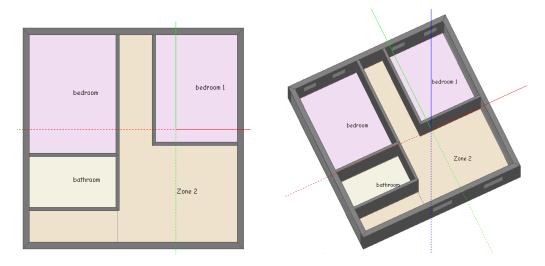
Floor plan of first floor Mid-terrace Model (and view with doors and windows)
